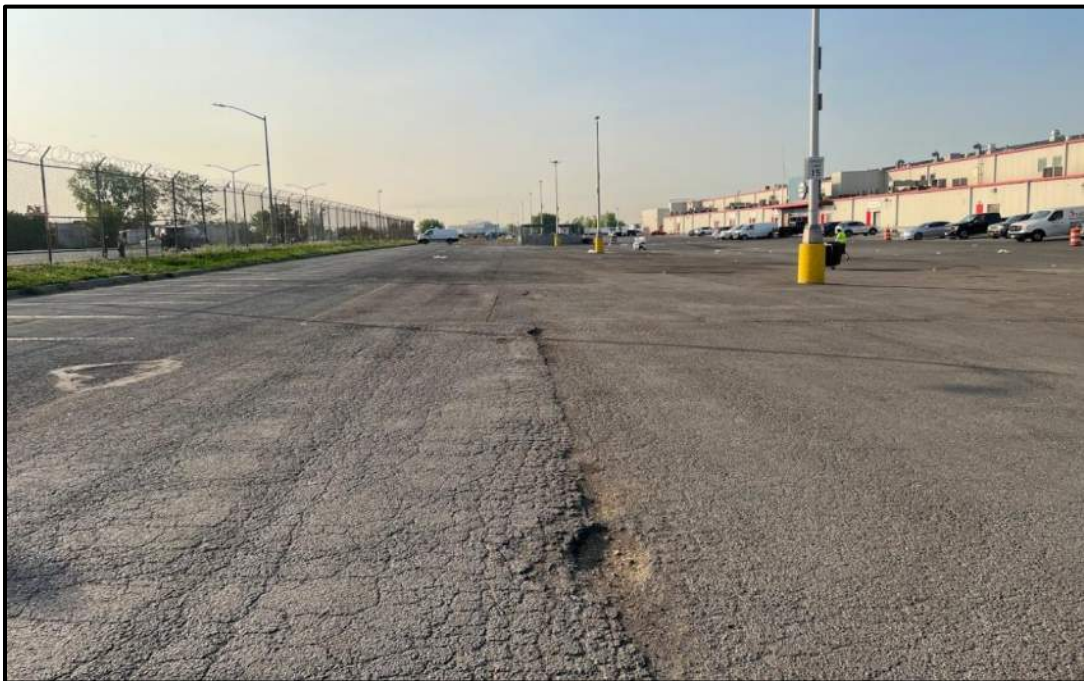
Facing southeast in the eastern portion of Site; cracking and small potholes present.
